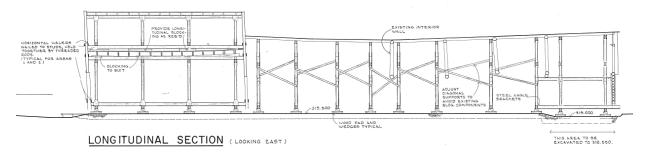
Longitudinal section, depicting the diagonal bracing between timber frames.
